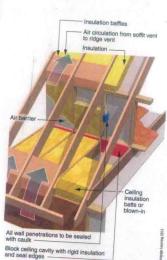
Attic knee walls must be fully air sealed with a backside air barrier. Blocking below knee walls prevents attic air from communicating with floor systems. Baffles in ventilated cathedral ceitings direct air around insulation.
